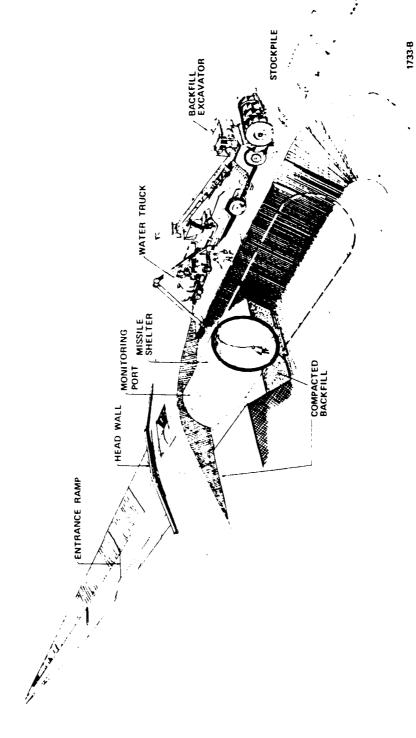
Backfilling protective shelter trench.
